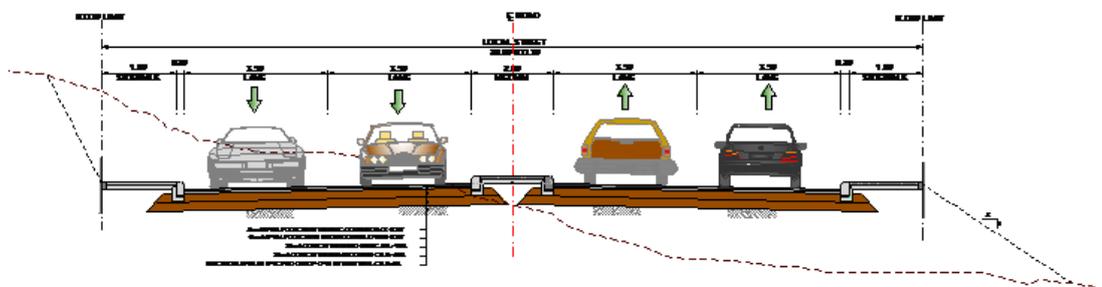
Typical Road Cross-Section for Roads A & C.
